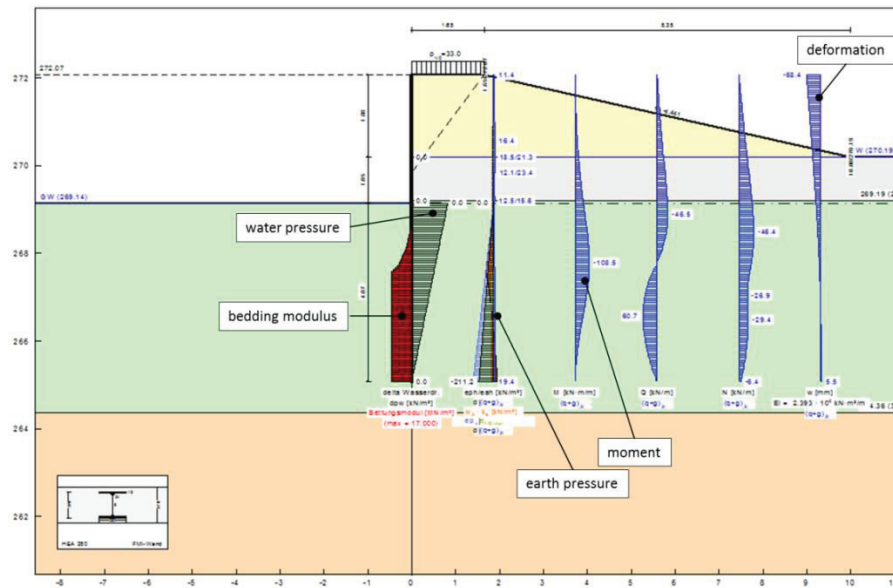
Results for a design cross-section with a soil mixing wall depth of 7.0 m and a distance between the steel reinforcement piles of 1.2 m (taken from Kerres & Haselsteiner, 2018).
